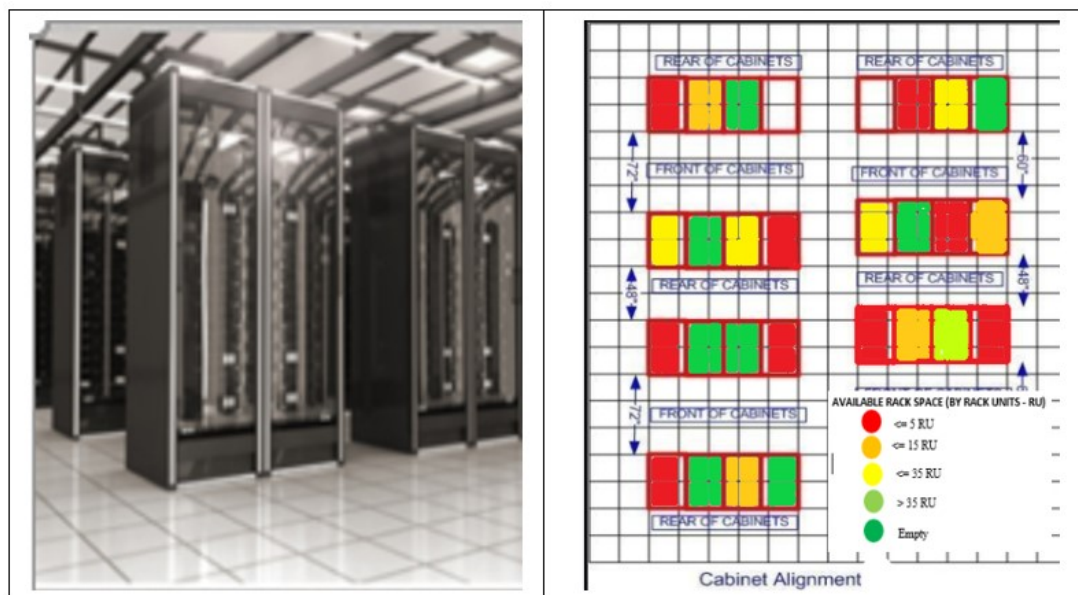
1 DC Floor Plan with Equipment Installed
